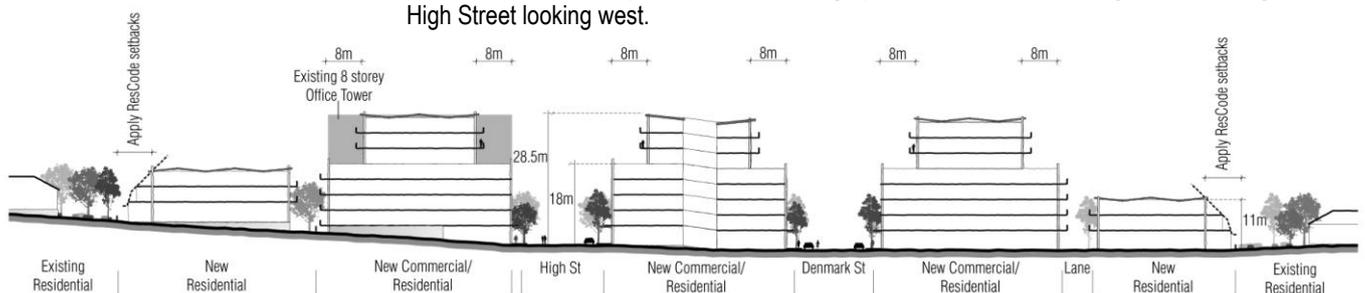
Cross-section through Denmark Street and High Street showing proposed building heights
